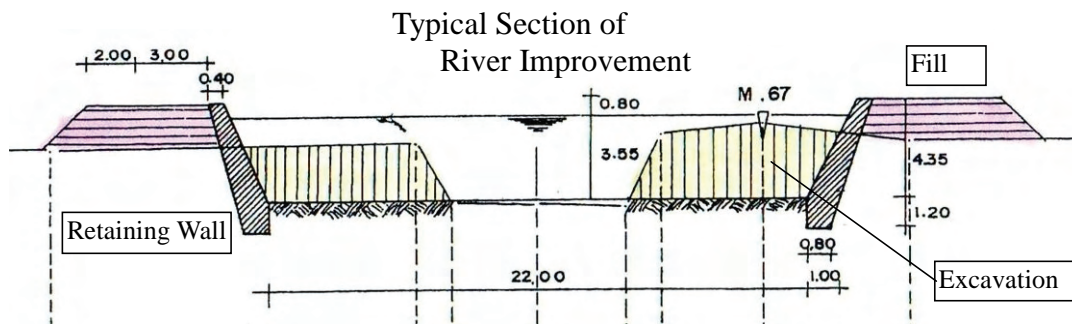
General Plan of Flood Prevention Project for Mati River
